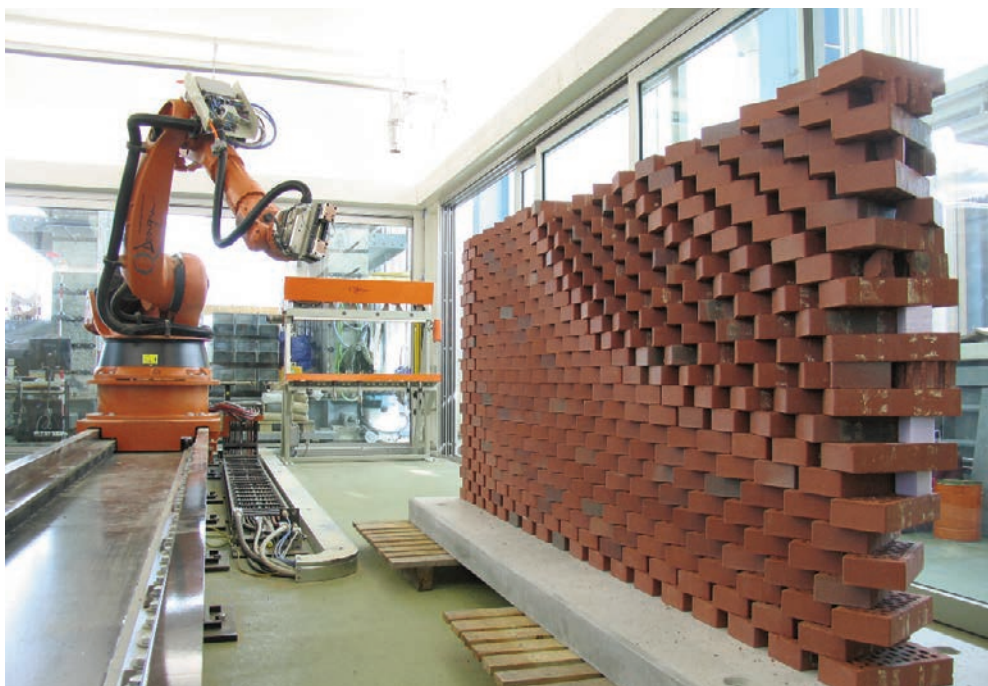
Robot (Pin) laying hollow bricks on a construction site (photo by Tibbo).
